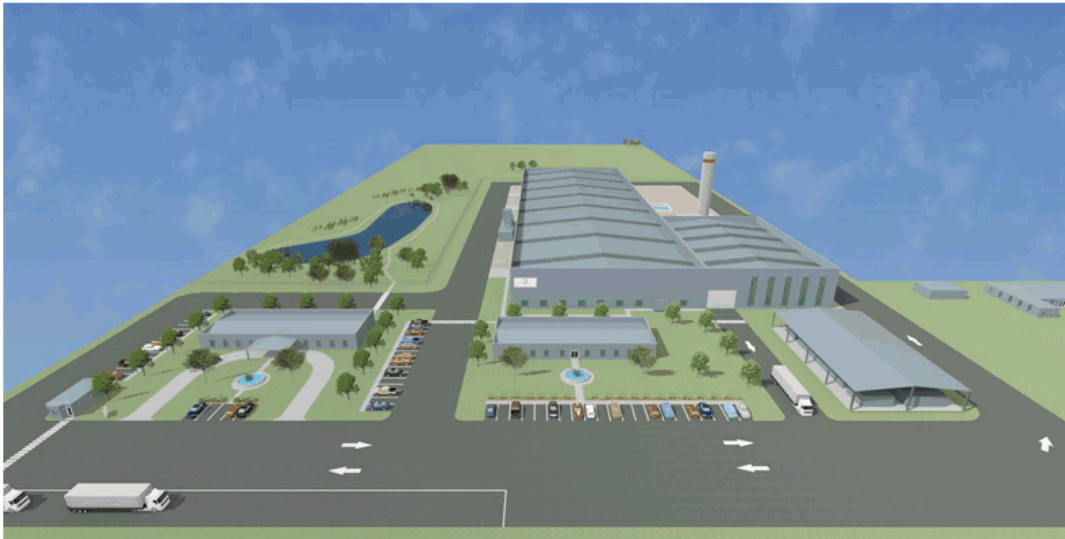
Proponent's image of proposed Hazelwood North facility (source WAA)
